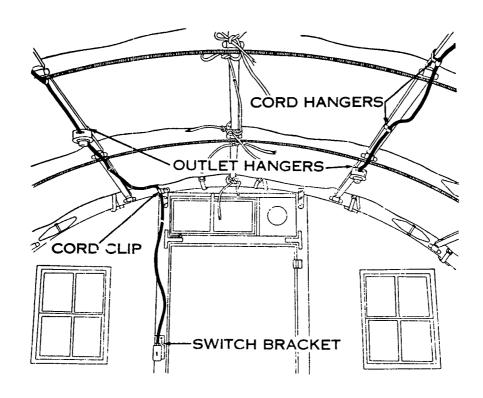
Attaching electrical outlet and switch assembly to inside of tent, frame-type, insulated, sectional.
